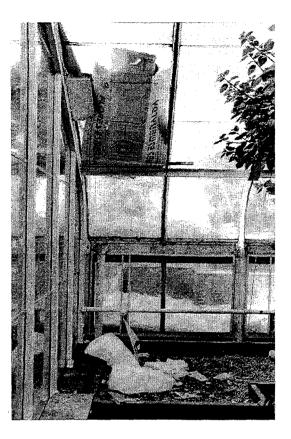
Snow Slid Off of Adjacent Greenhouse Gables Onto Lower Greenhouse Roofs Resulting in More Damage (Photograph courtesy Longwood Gardens, Inc.)
